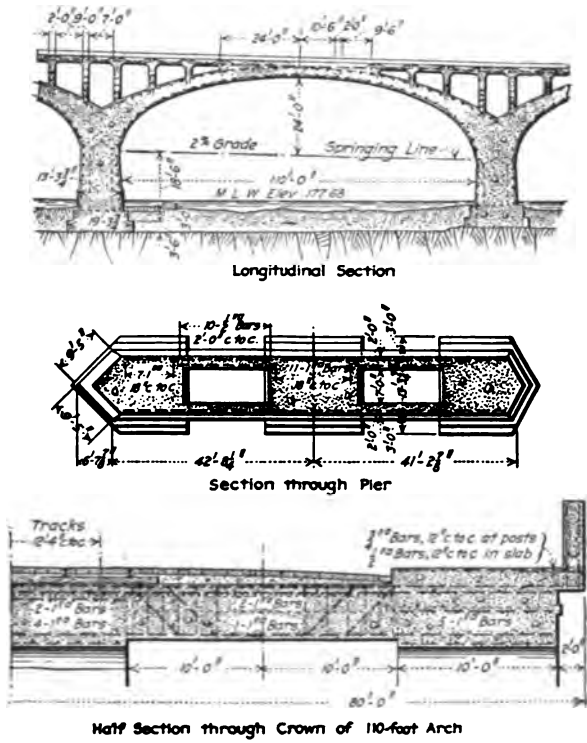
Details of Penn Street viaduct, Reading, Pa.
